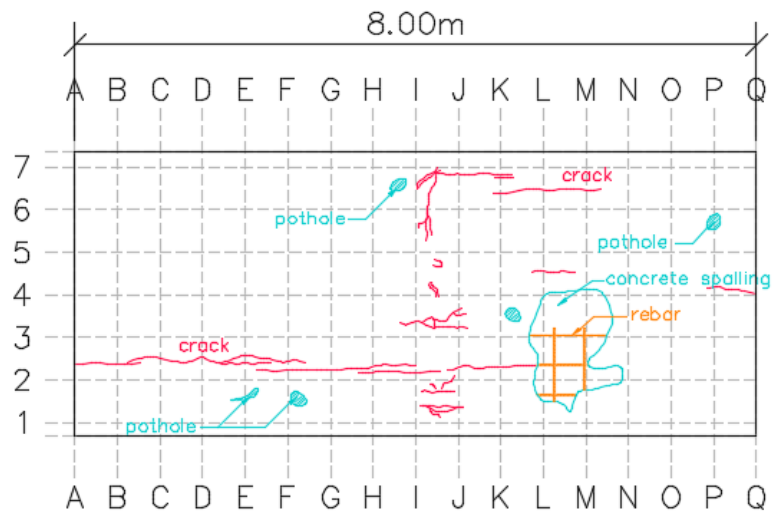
Damage location based on visual inspection on span no. 8
